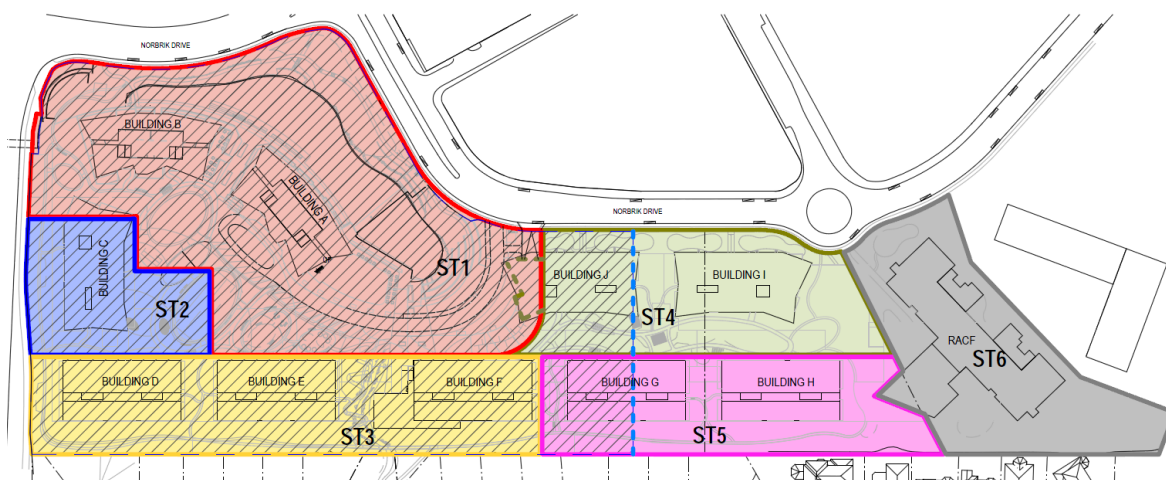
Stage 1 Development (Source: Architectural Plans)
